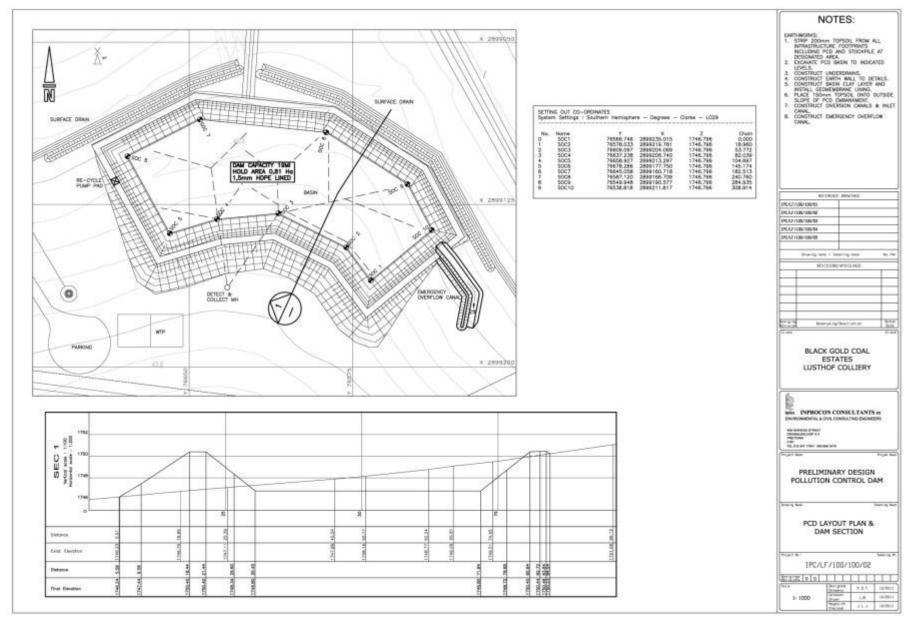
(b): Pollution Control Dam - Layout Plan and Dam Section.
